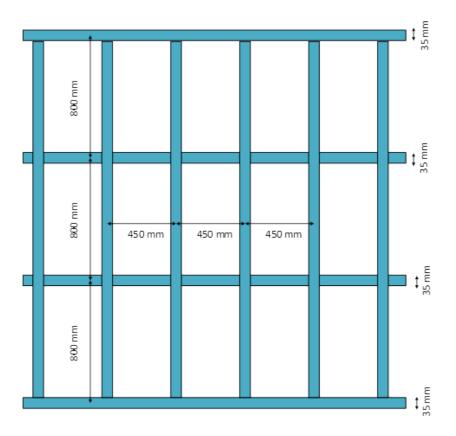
BRICK VENEER STEEL FRAME ELEVATION PROFILE
